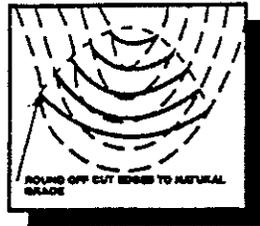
CONCEPTUAL GRADING PLAN
